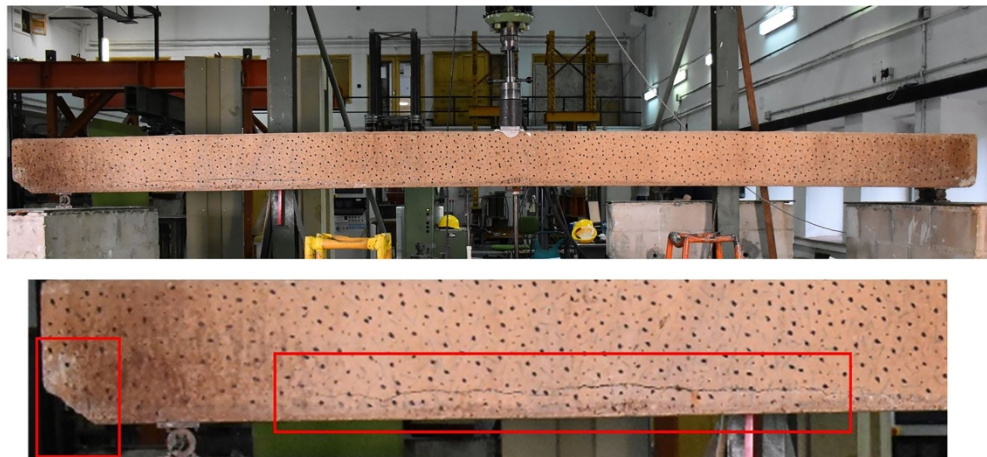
VIGA 470 beam: quantified damage by visual inspection.
